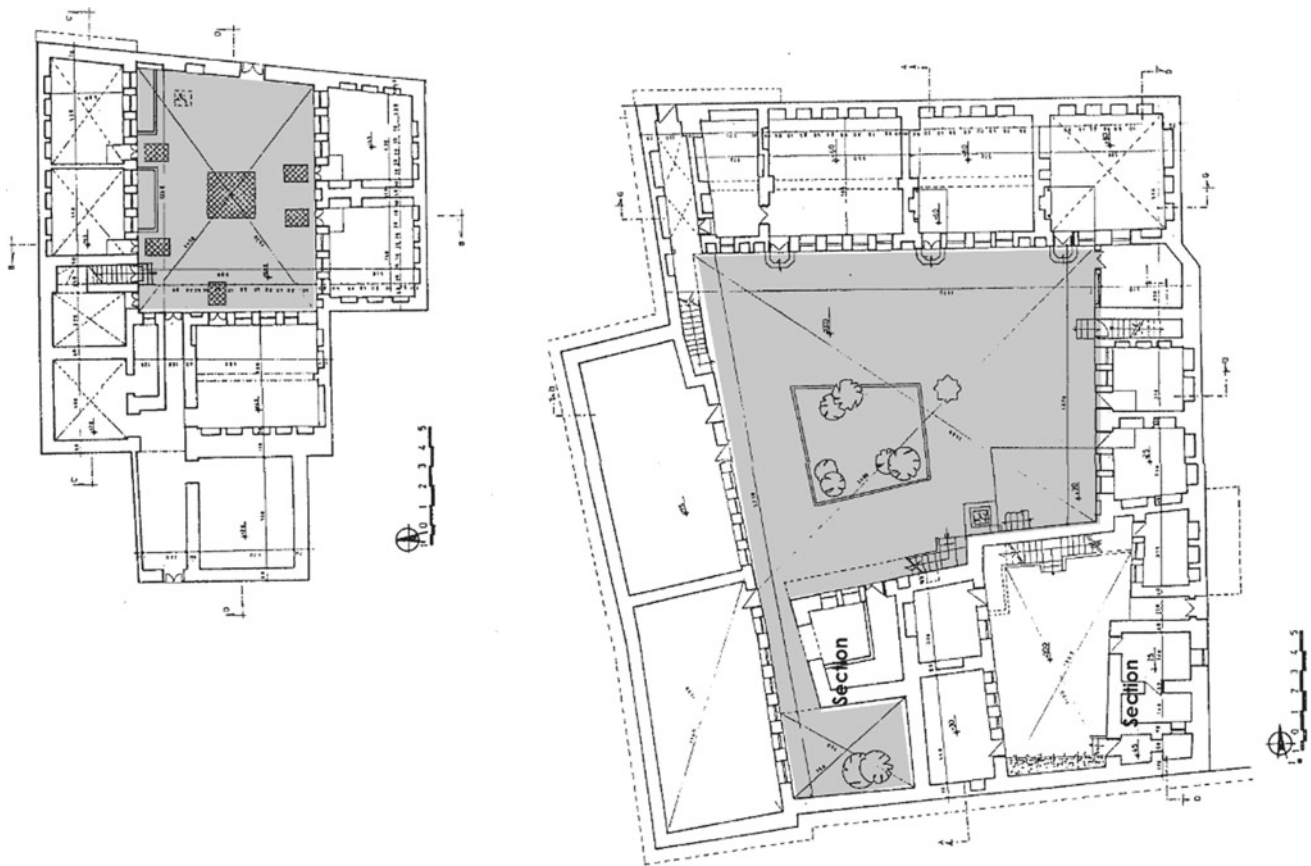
To the left Dawama's House, Ground and First Floor Plans (Taqtq 1995). To the right Mehi'sh Mansion, Ground Floor Plan (Taqtq 1995)
